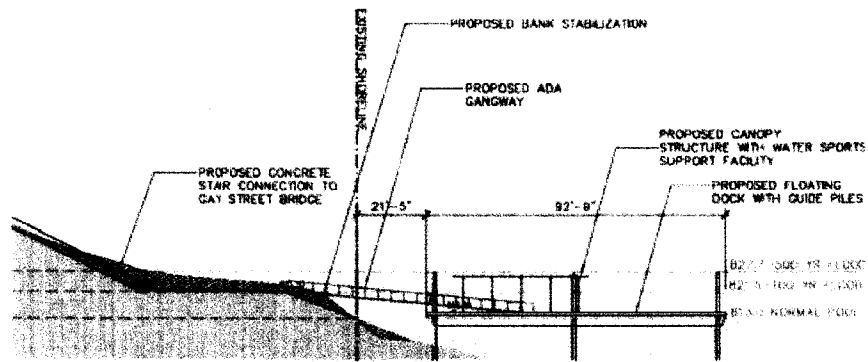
Schematic Design, Section E, Scale 1"= 30' (Hargreaves Associates, 2008).
